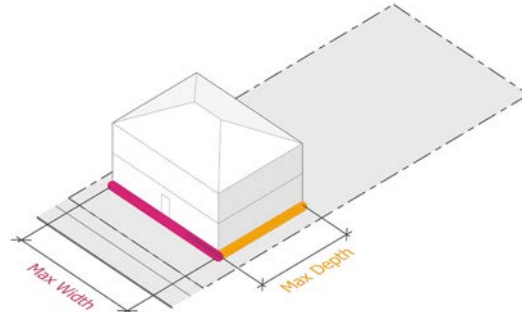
Example of House-Scale and Block-Scale Buildings
